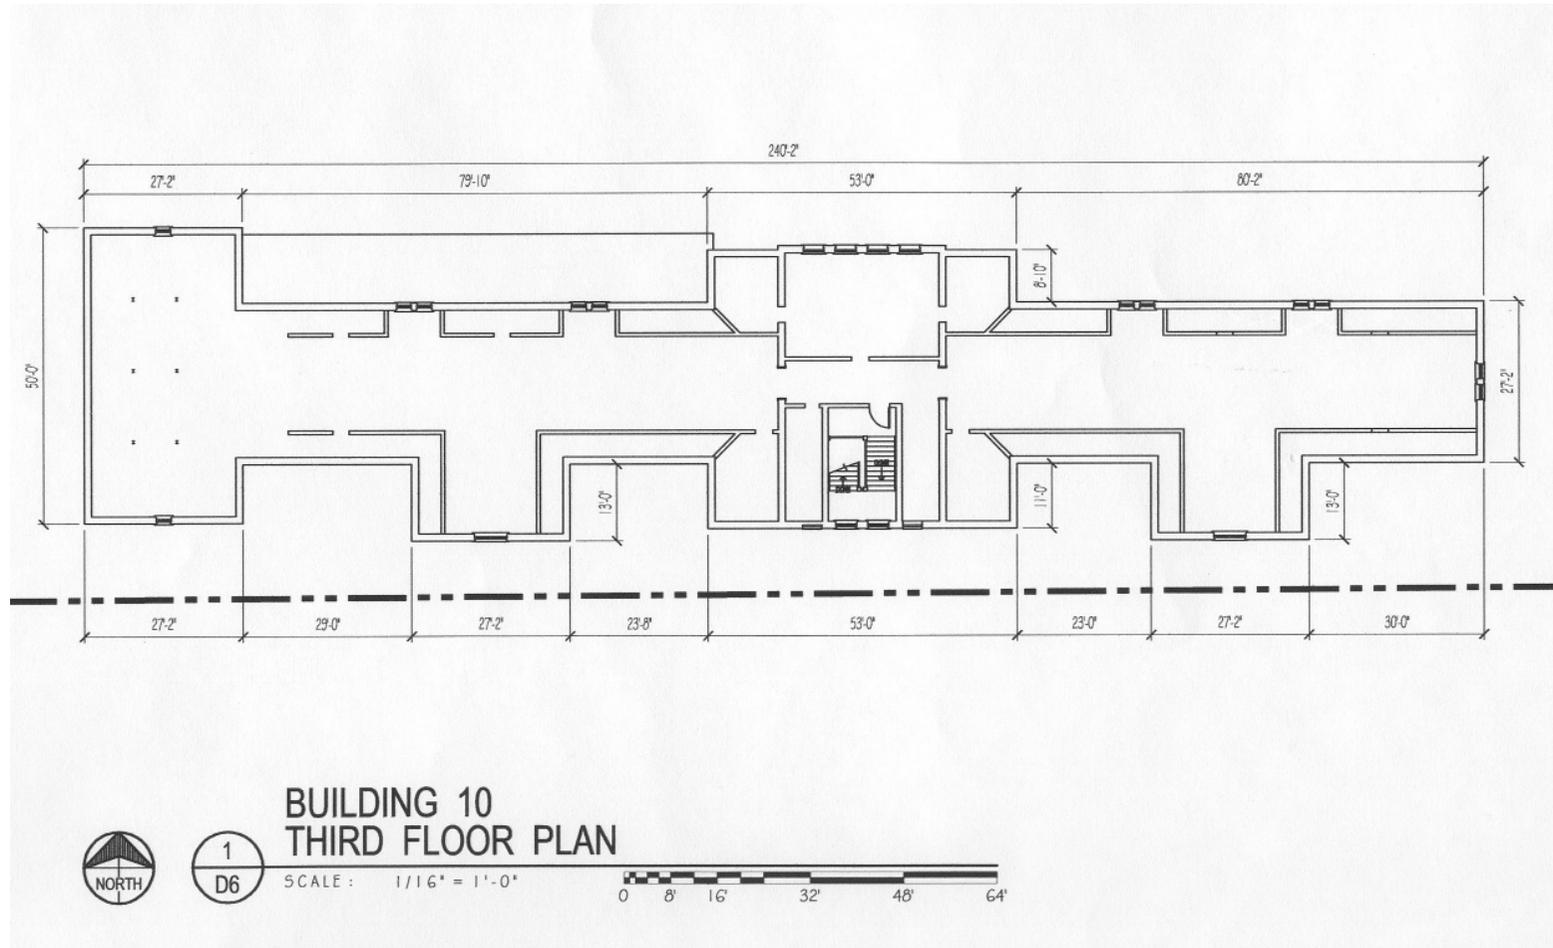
Third floor (or attic) plan of Building 10, showing existing conditions (Walton and Associates 2003).
